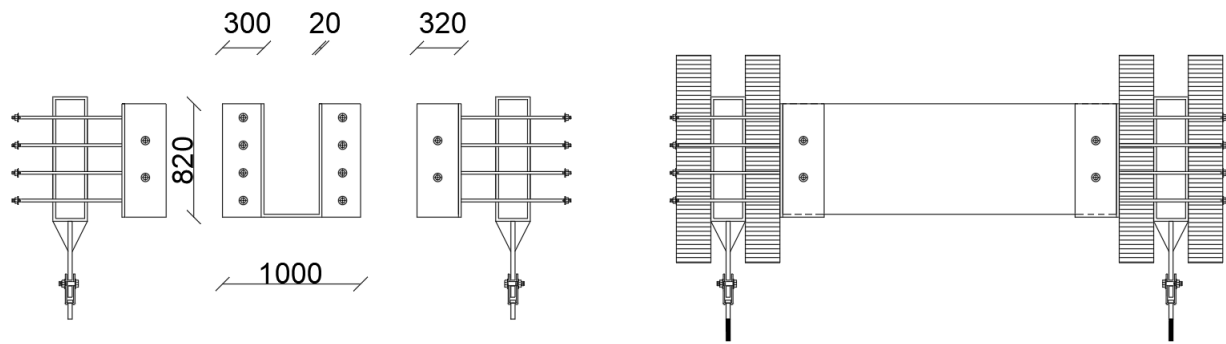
Connection Design Proposal – Horizontal Beams to Structural Arches
